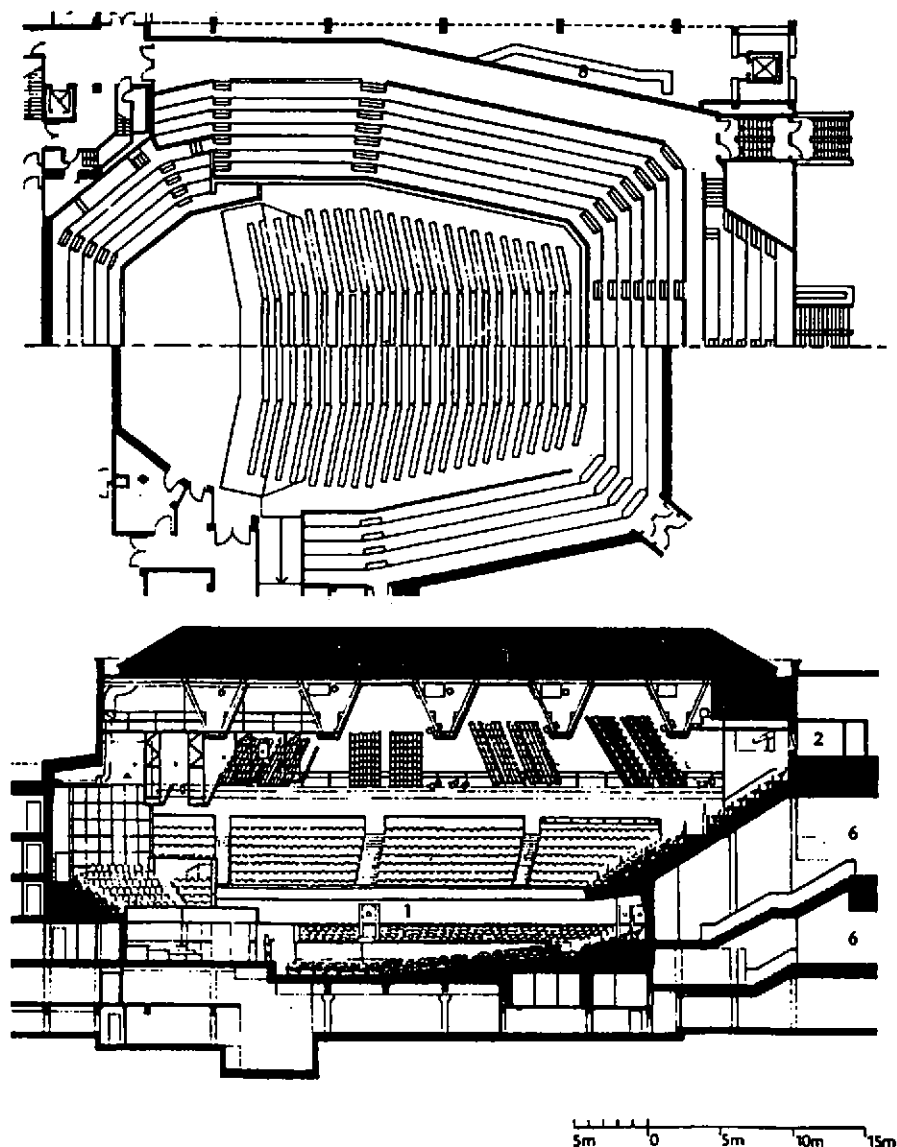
Plan and long-section of the Glasgow Royal Concert Hall
